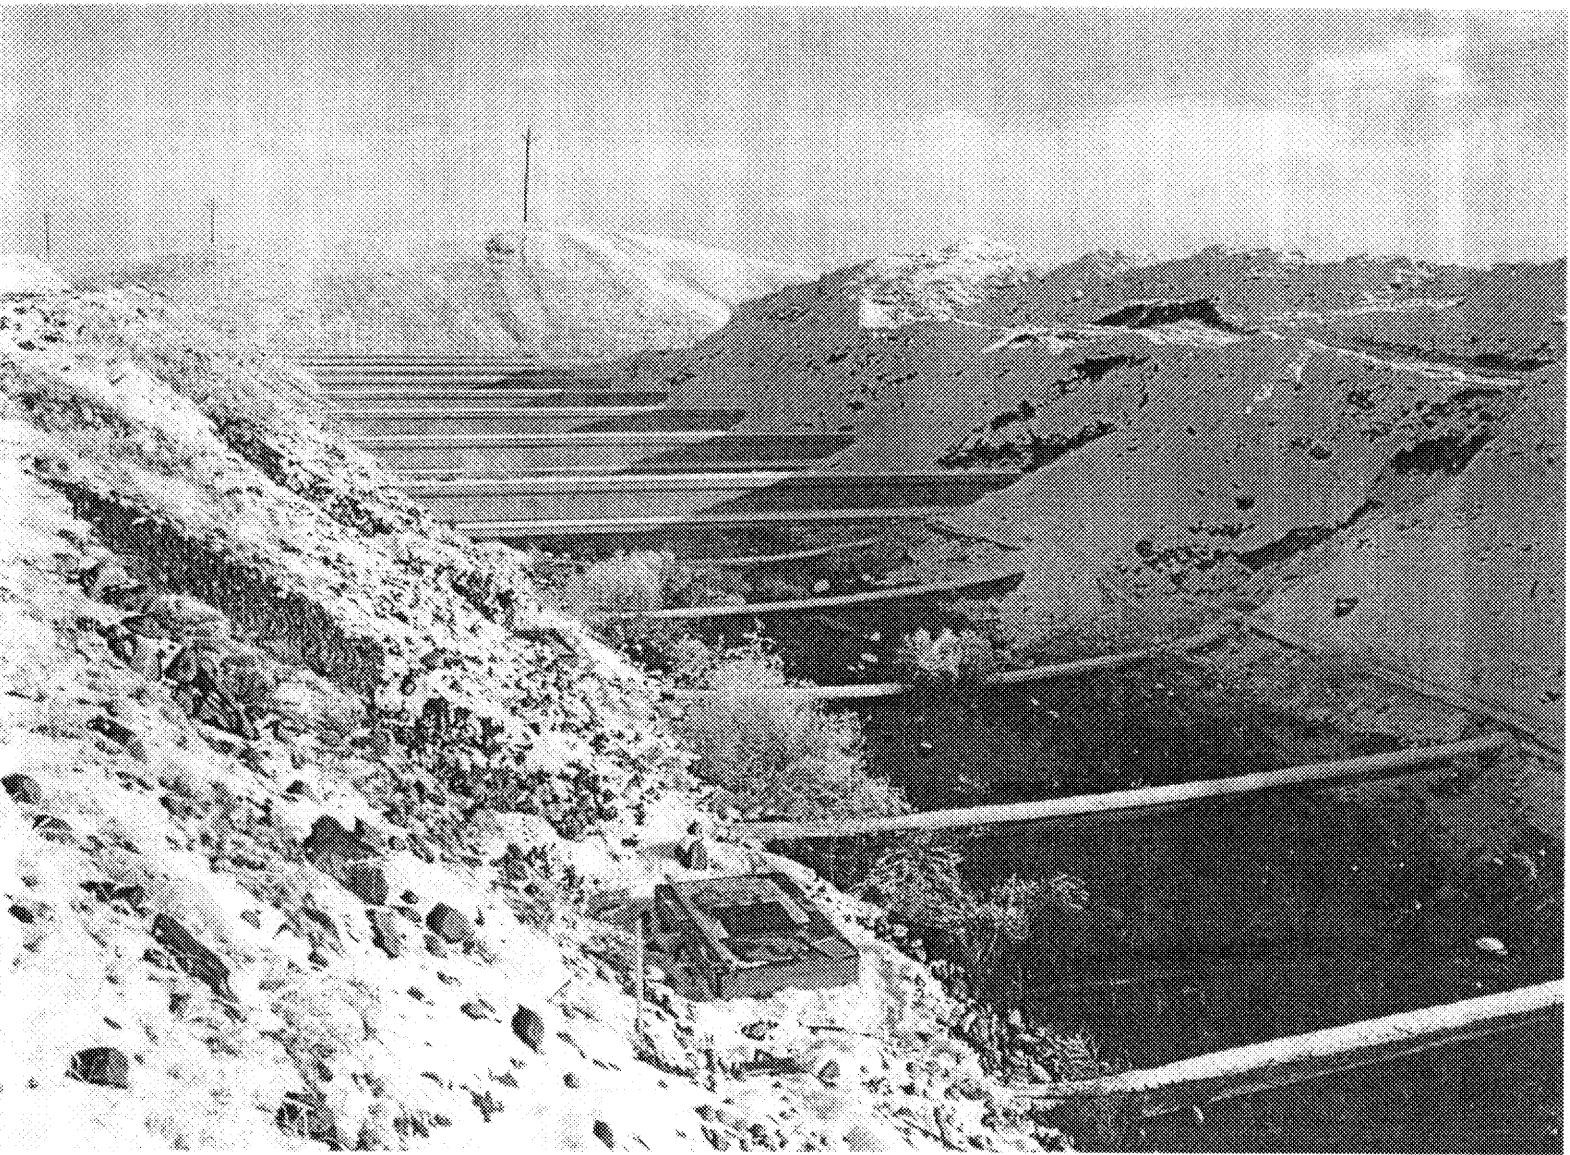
Concrete Support Beams for I16-N-1 Trench Cover Installation During 1980's.
